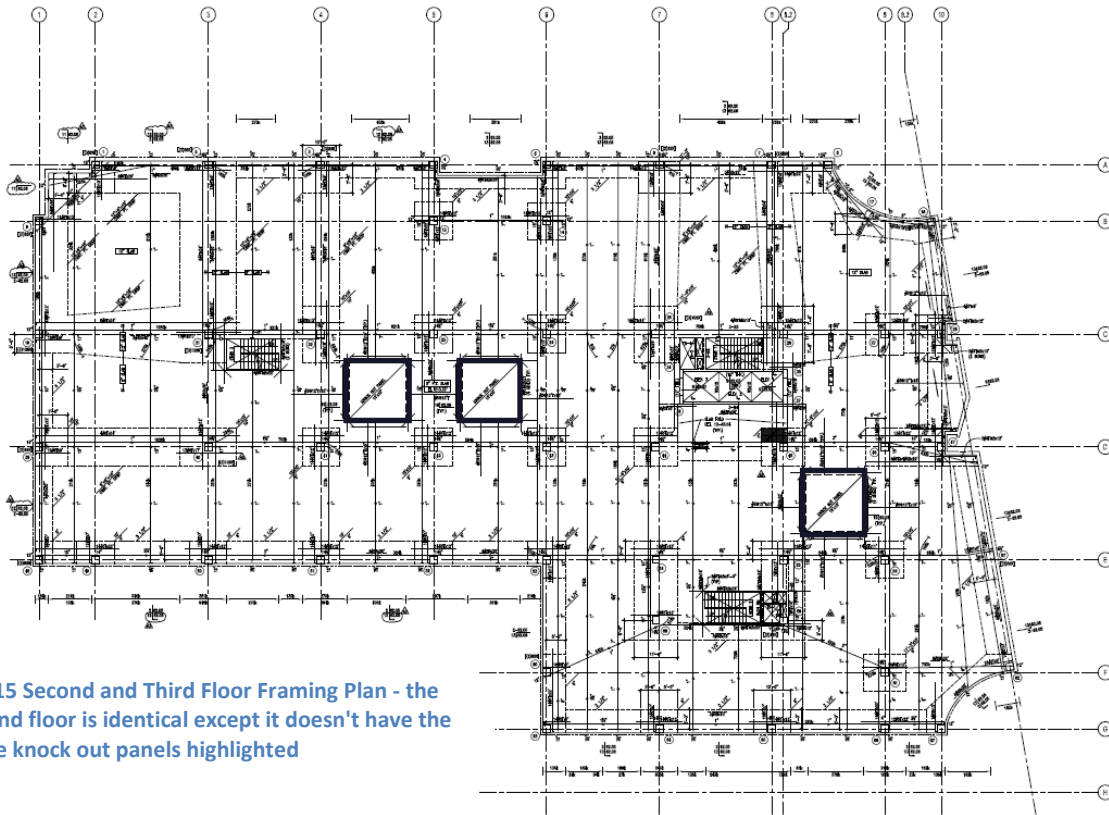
Second and Third Floor Framing Plan - the second floor is identical except it doesn't have the three knock out panels highlighted
